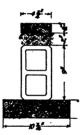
McRoy Tile, 24-Duct Conduit, Class "A" Construction.
